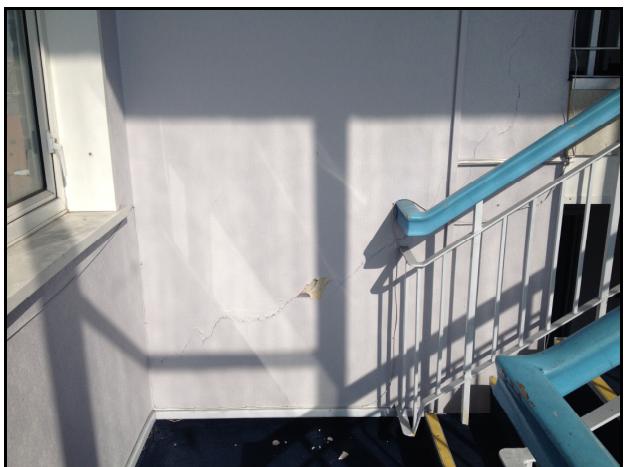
& 11:- showing diagonal cracks local to north and south stairwell
